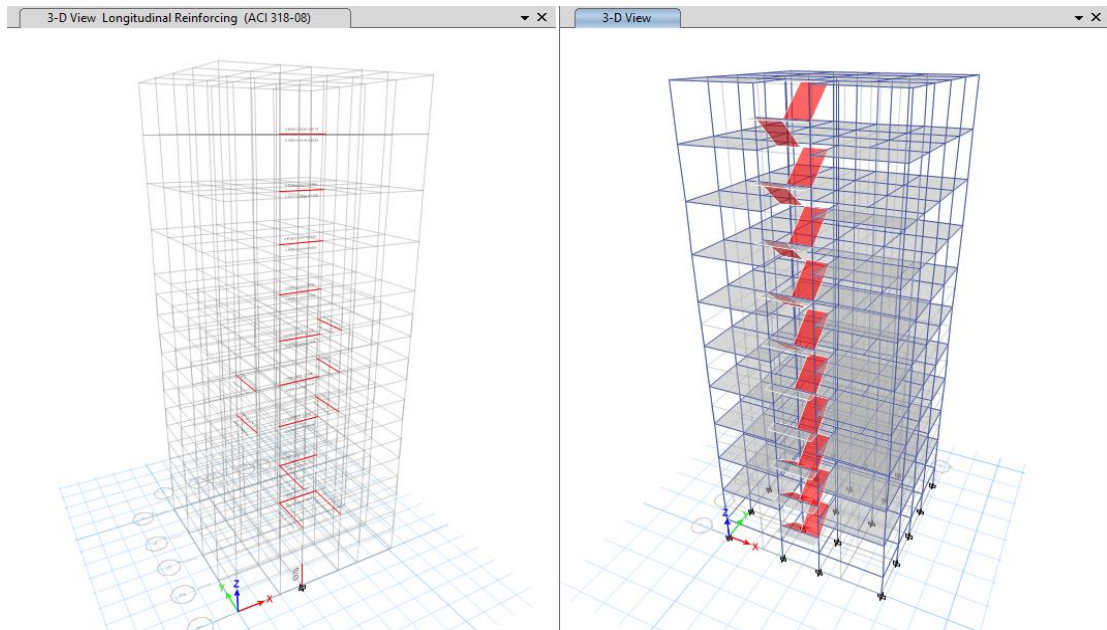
(G+10) story Residential Building several beams and column failure in Rangpur district in zone 3
